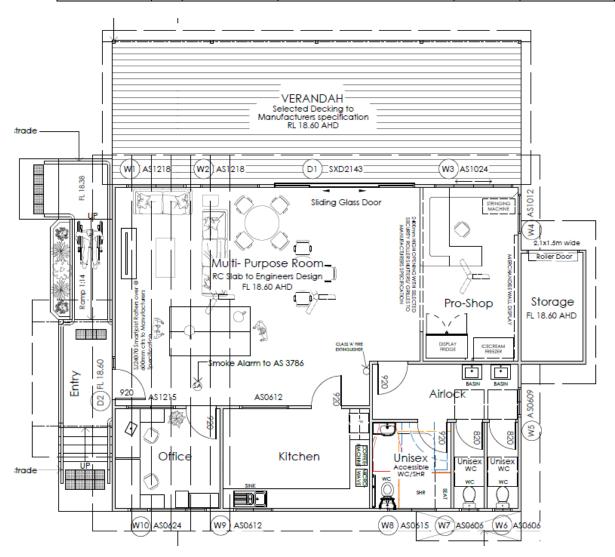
Floor plan of clubhouse indicting amended kitchen design
